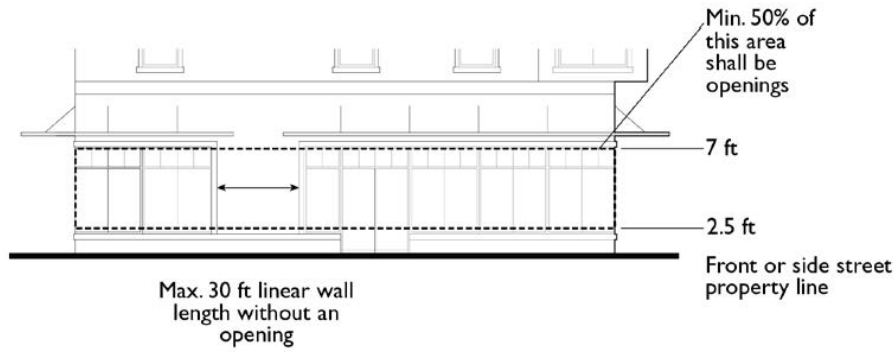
B: BUILDING TRANSPARENCY/REQUIRED OPENINGS
